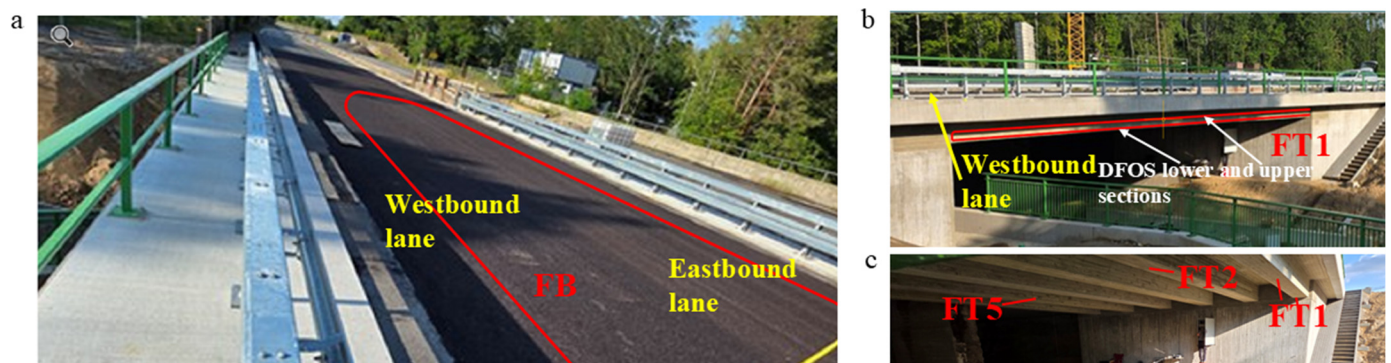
Hubertus bridge showing the schematic placement of the selected sensing cable loops embedded (a) in the deck slab (b) and in the precast girder FT1; (c) Location of the girders with sensing cable loops selected for the load test.
